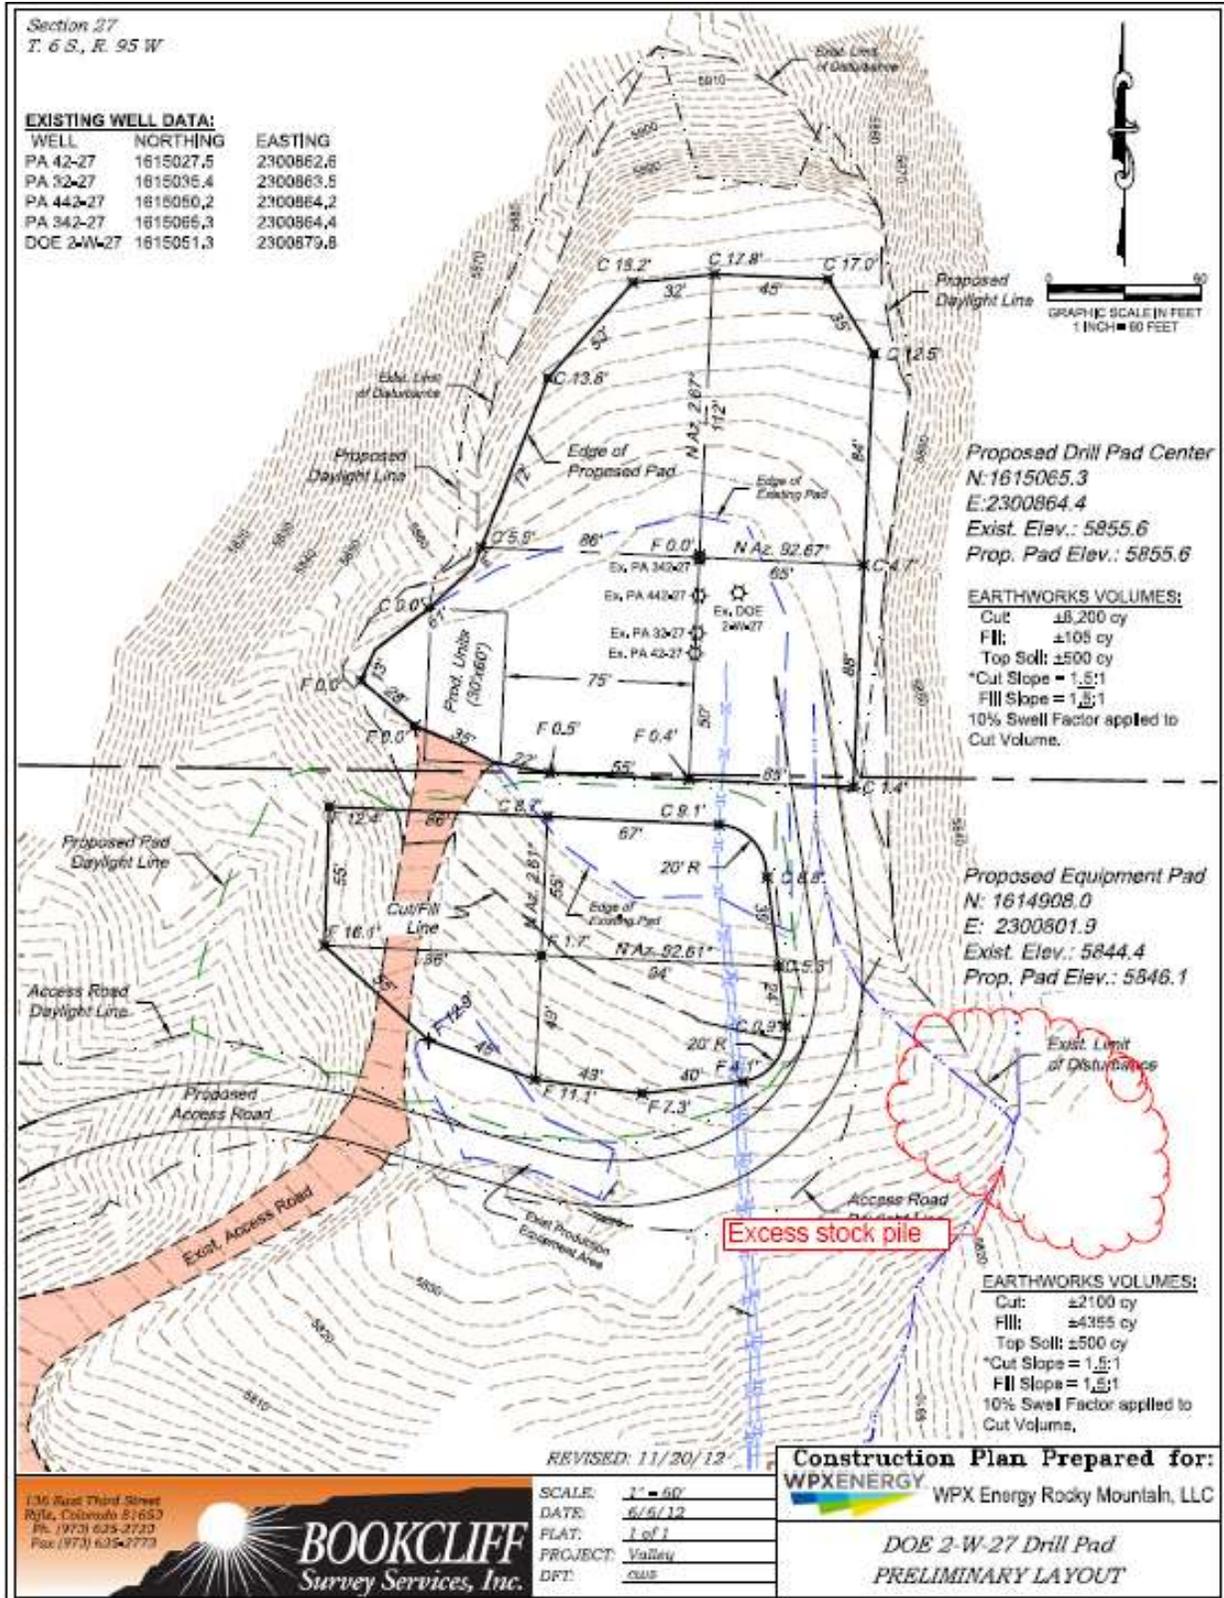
DOE 2-W-27 Pad Expansion Layout with Split Pad Platforms and Realigned Road
